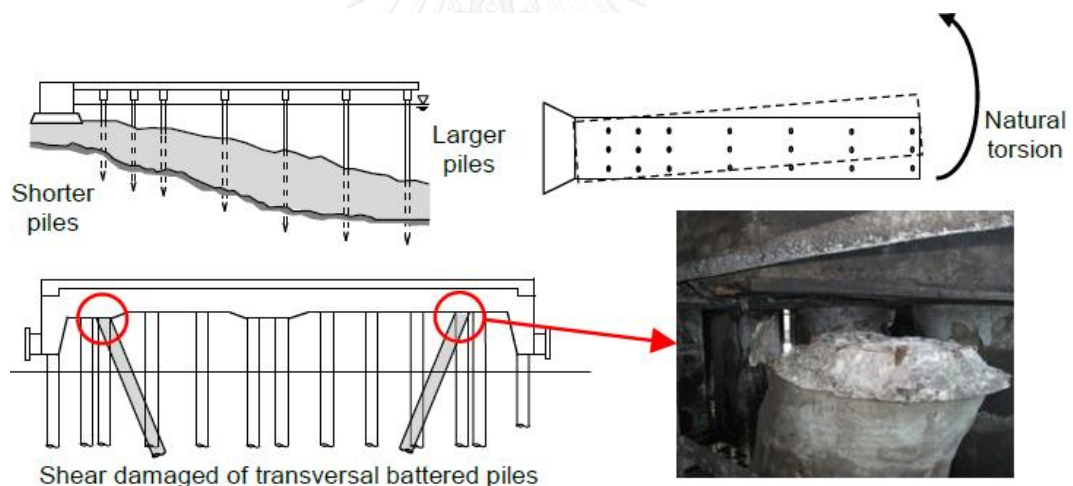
Shear damage in transversal battered piles due natural torsion at Huachipato Pier (Brunet S. et al (2012))
